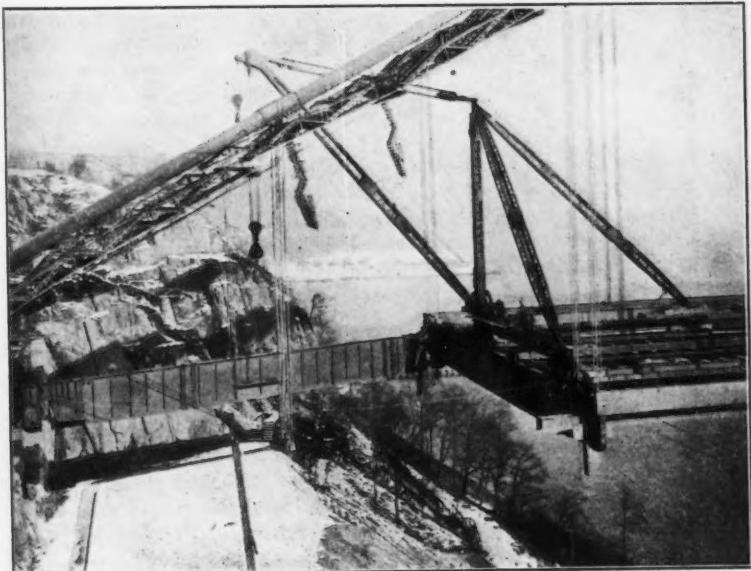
STEEL ERECTION IN SIDE SPANS; FLOOR-BEAM BEING SET IN PLACE.
